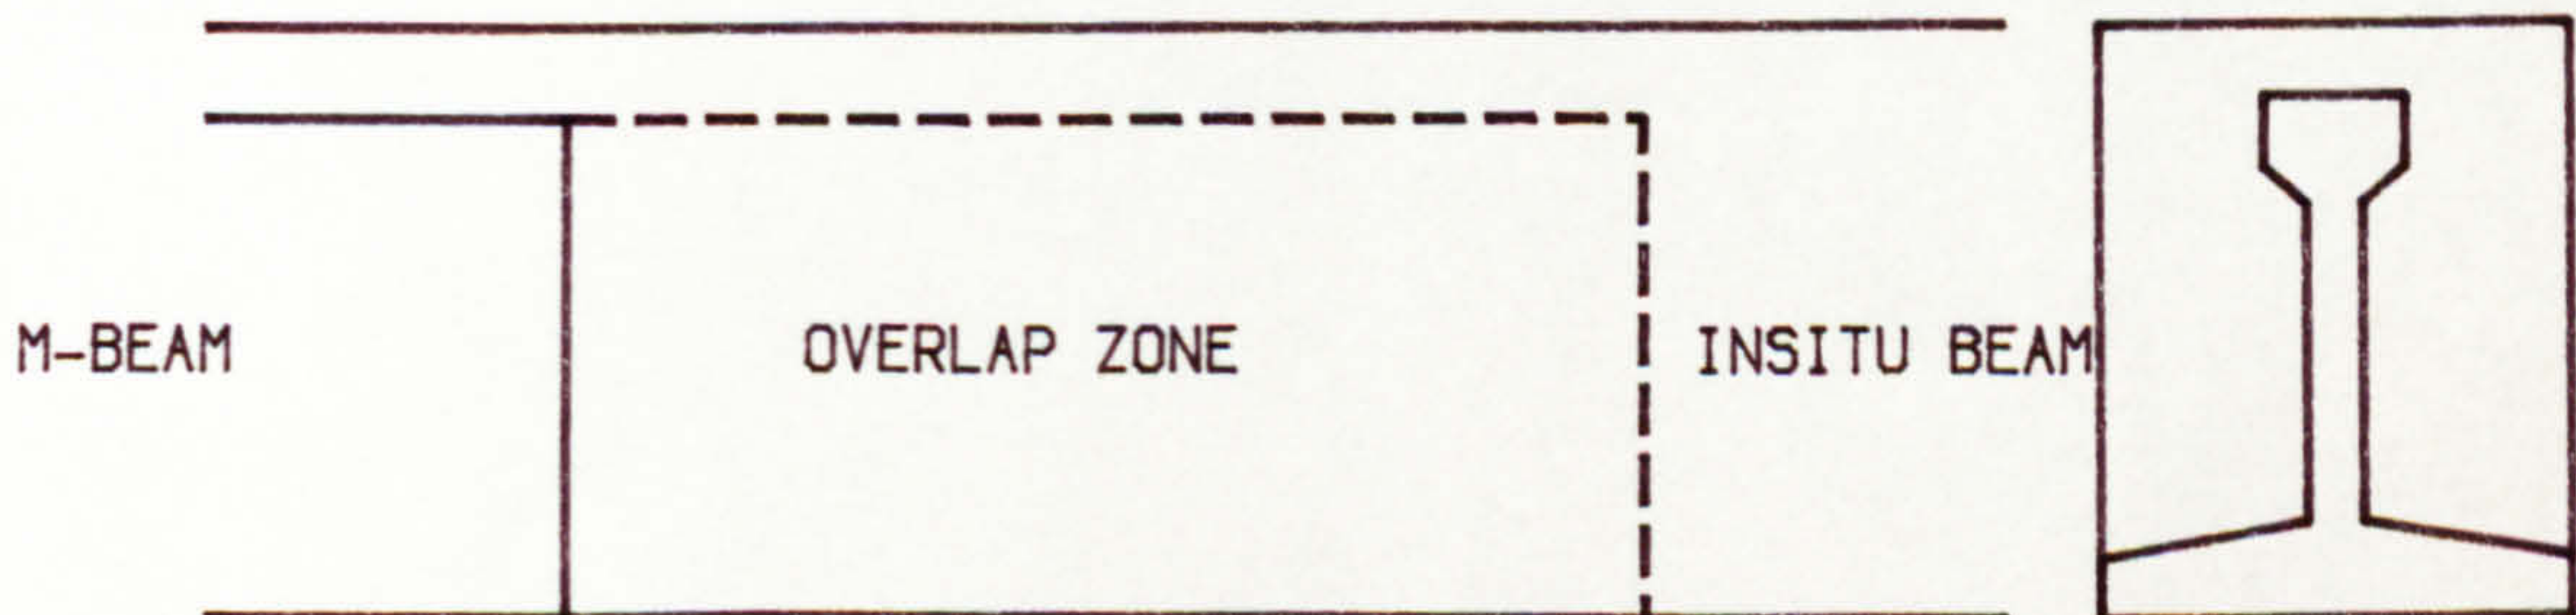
VERTICAL SEPARATION BETWEEN PRECAST BEAM AND IN-SITU NIB
